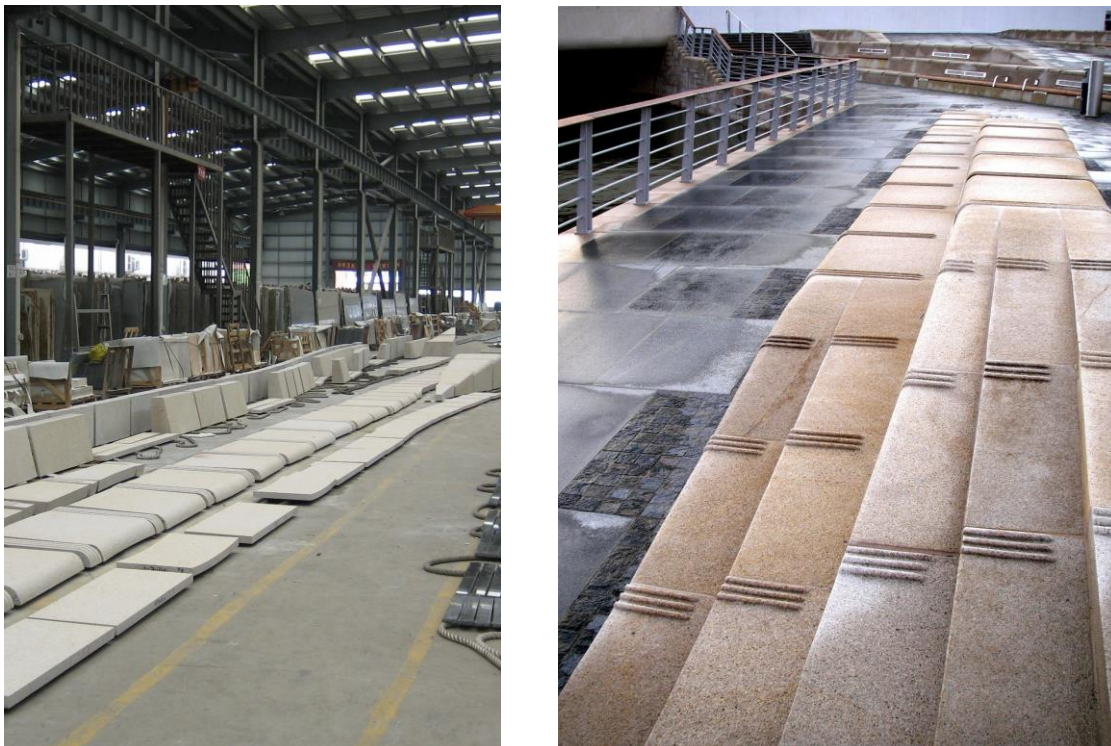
Photo stone seat walls being laid out in china & completed seat walling.
